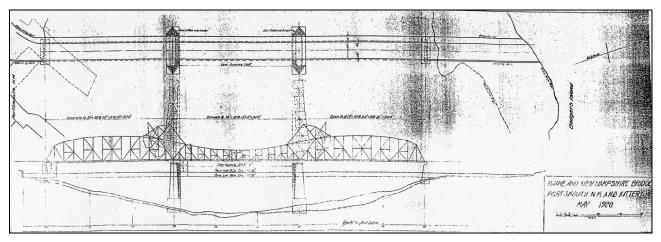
Design for Bascule Bridge (Strawbery Banke) [Larger scale plan at Tab O]
